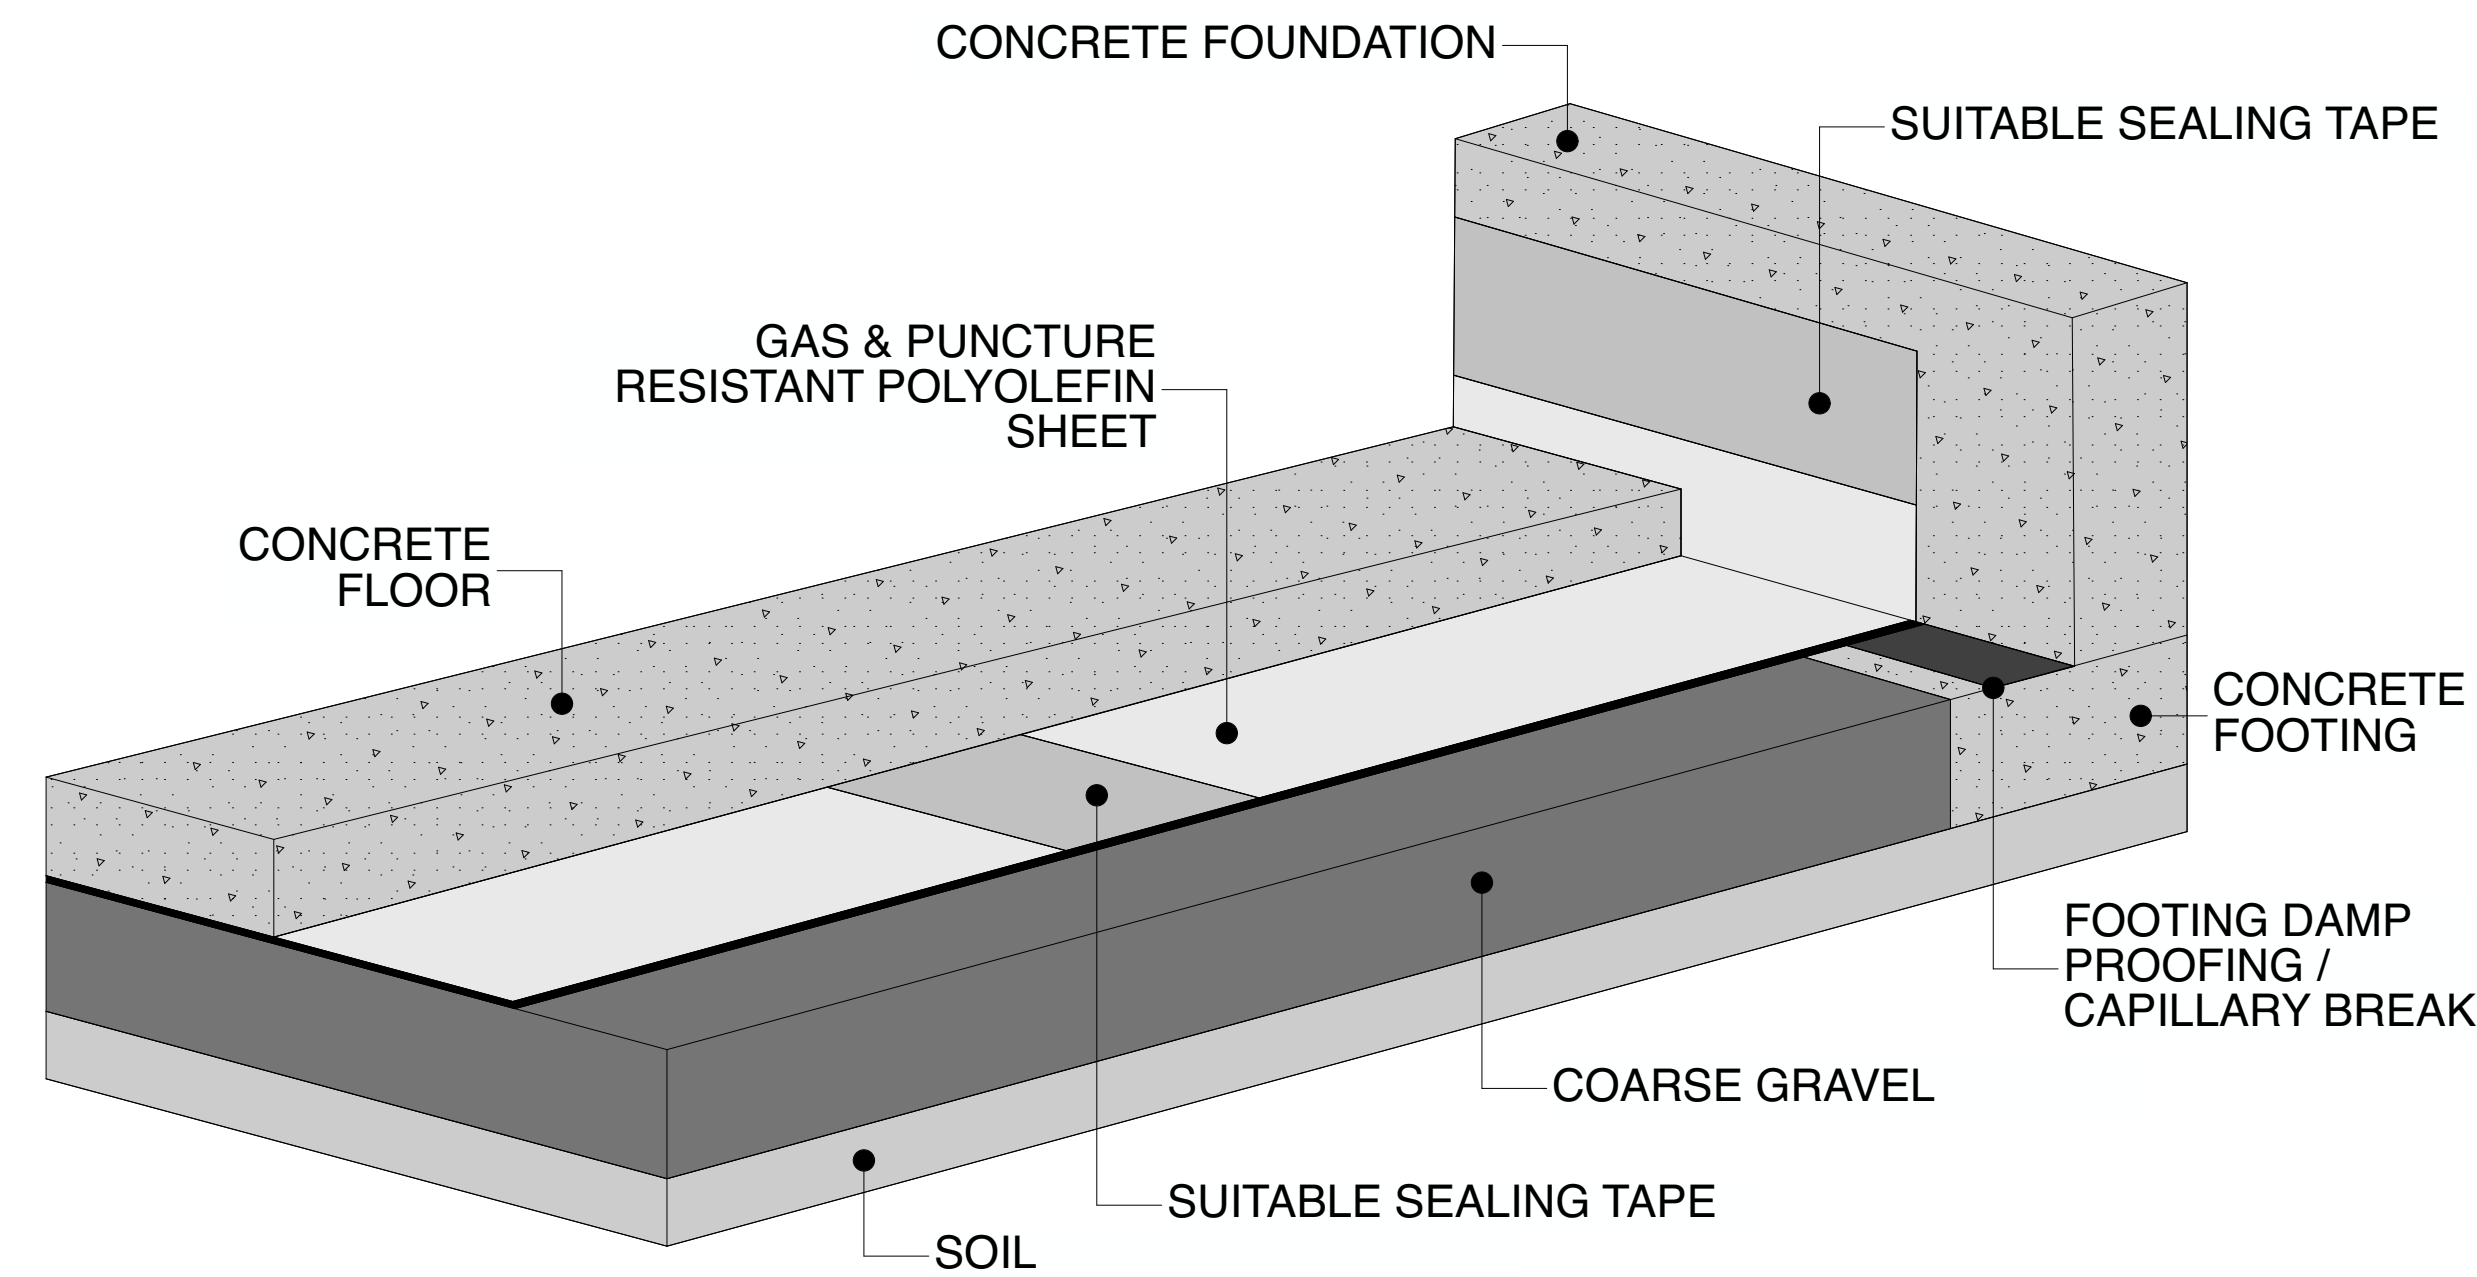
SEALING SUB-SLAB MEMBRANE VERTICALLY TO CONCRETE FOUNDATION WALL
